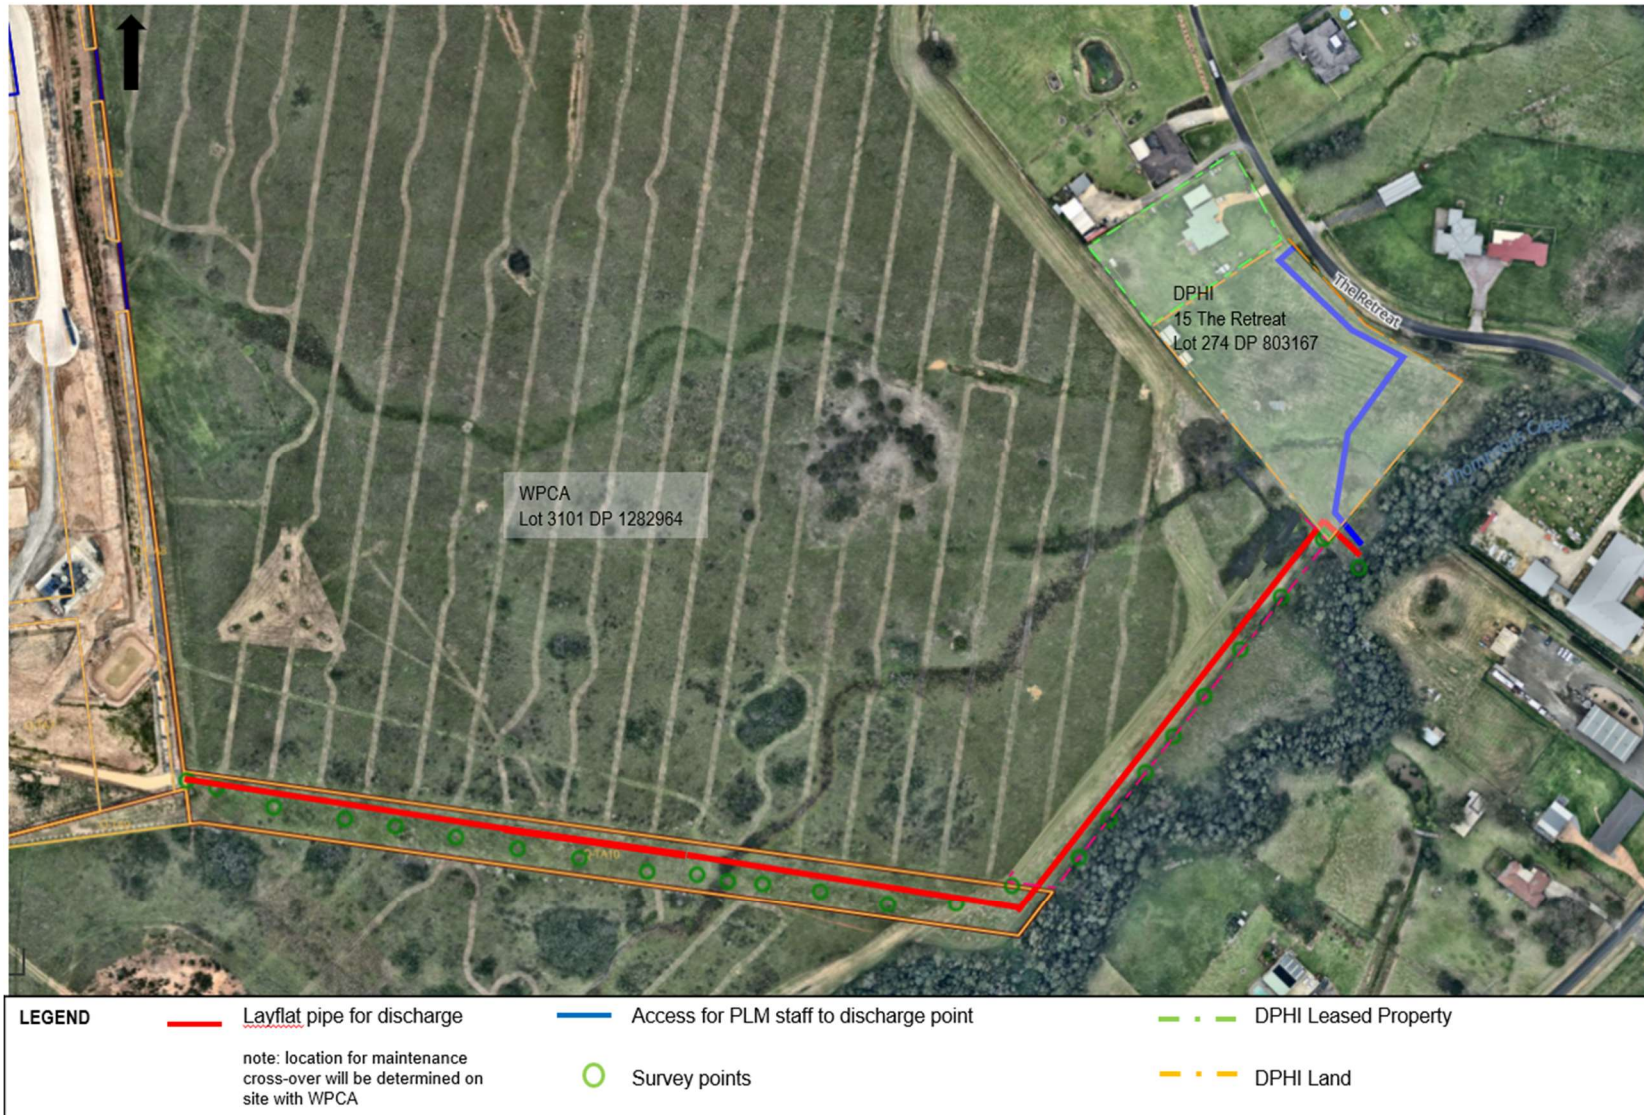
Aerotropolis Core construction footprint with WTP pipeline. The location of the steel pipe and road base ramp along the layflat pipe alignment will be determined in consultation with WPCA
